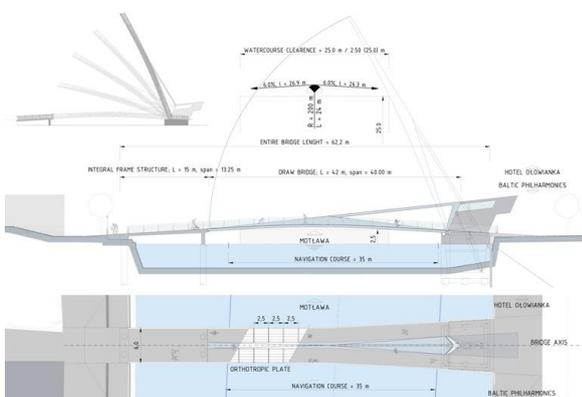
Bascule Footbridge in Gdansk - general layout and alignment
